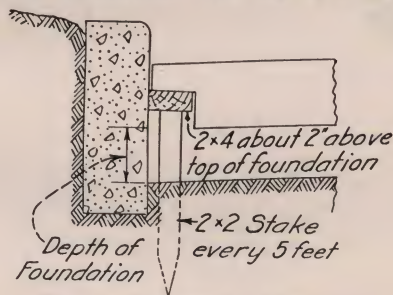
Support for Templet in Center of Wide Street or Where Curbs are Uneven.
